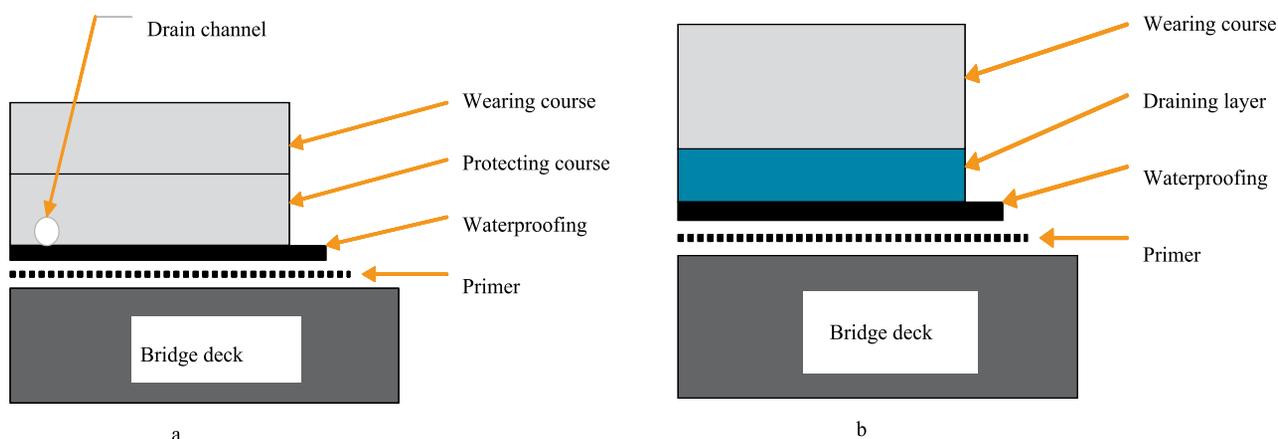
Draining systems in bridge deck pavements: a – traditional system; b – new system proposed in this study
